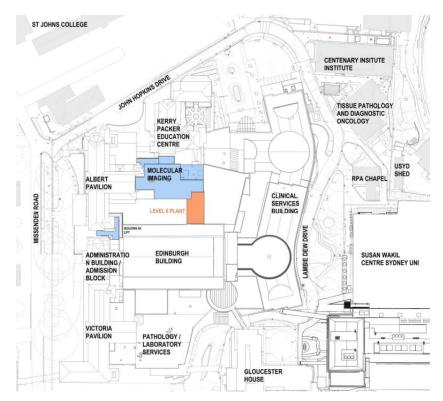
RPA Hospital Site Plan detailing the location of the proposed Level 6 Plant Room to Level 06
